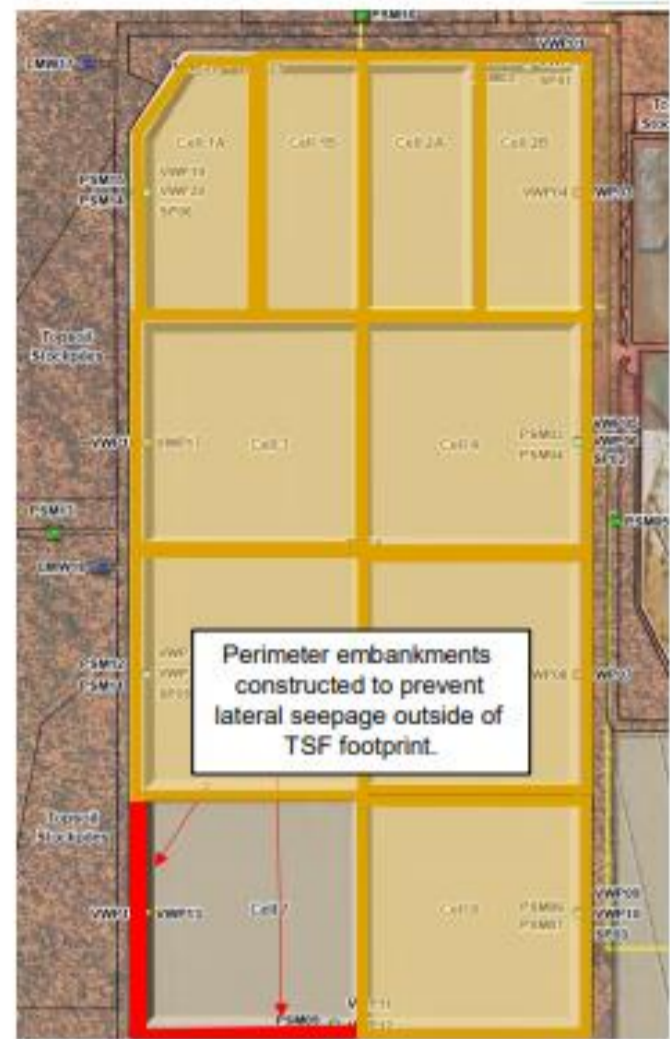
Plan showing Stage 9 of the TSF construction - Cell 8 (new)
